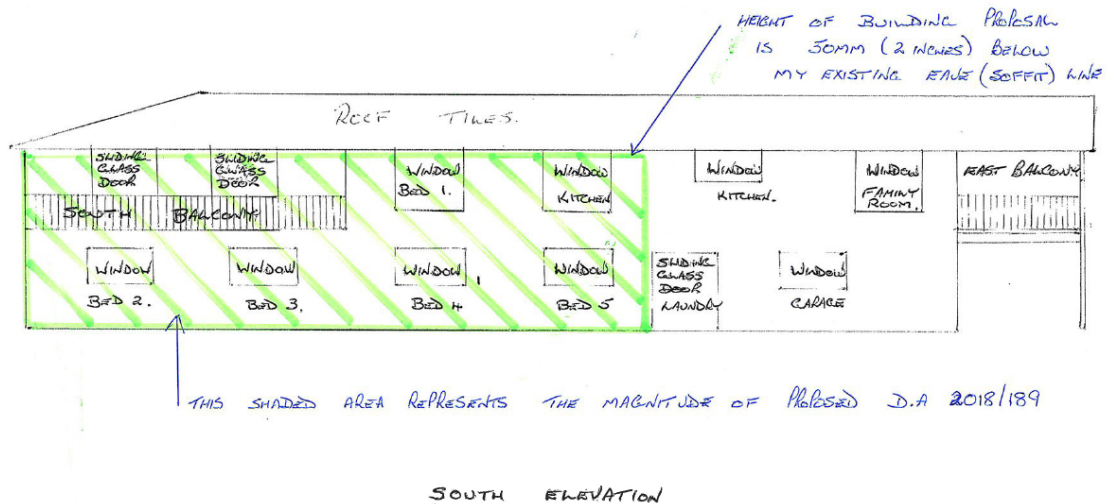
Objector assessment of impact on dwelling to North of 4 Page Court
